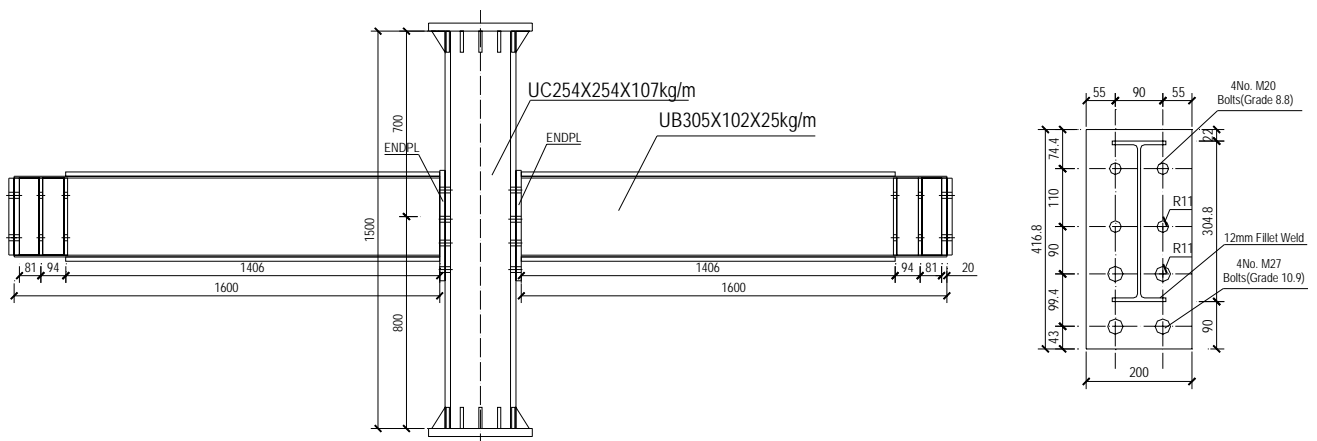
Bare Steel Extended End-Plate Joint Detail (CR1, CR2 and CR3)
